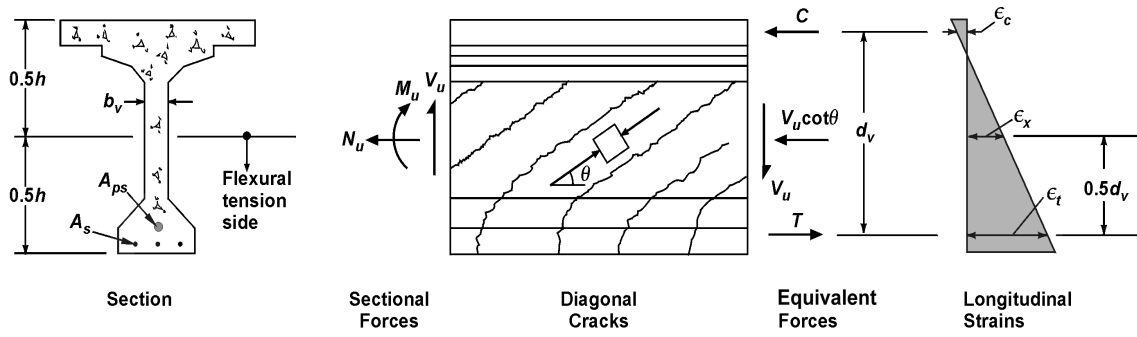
Illustration of Shear Parameters for Section Containing at Least the Minimum Amount of Transverse Reinforcement, $V_p=0$.
